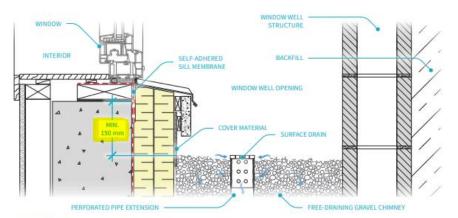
Window well section showing free-draining gravel and surface drain connected to foundation drain complete with perforated pipe extension (section view).
